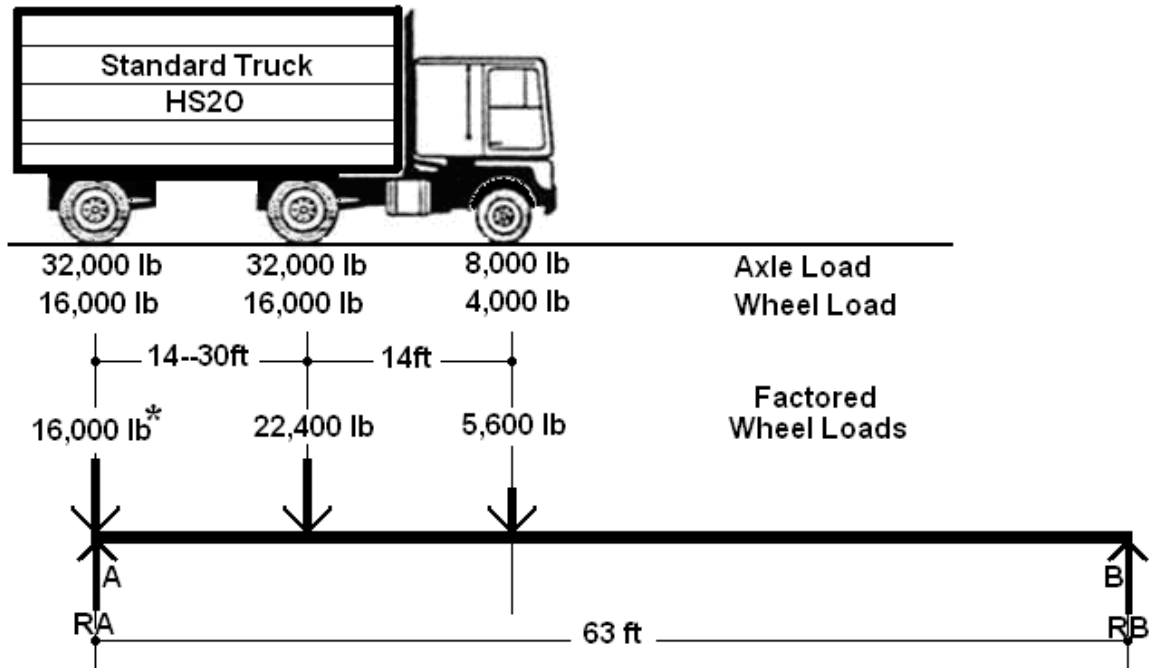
Position and Loading of HS20 Truck to introduce Maximum Shear in an Interior Girder.
